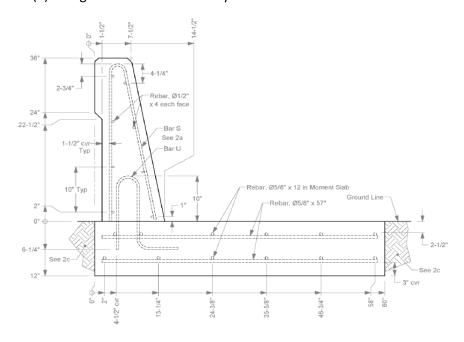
Crash Tested Moment Slab Foundation for SSTR (1)
